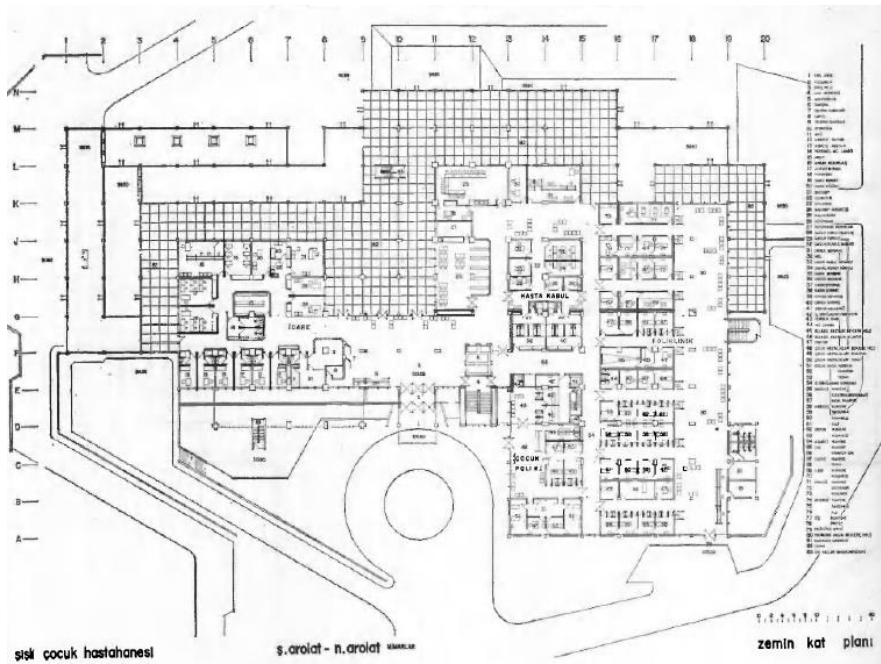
Ground Floor Plan, Şişli Children's Hospital
